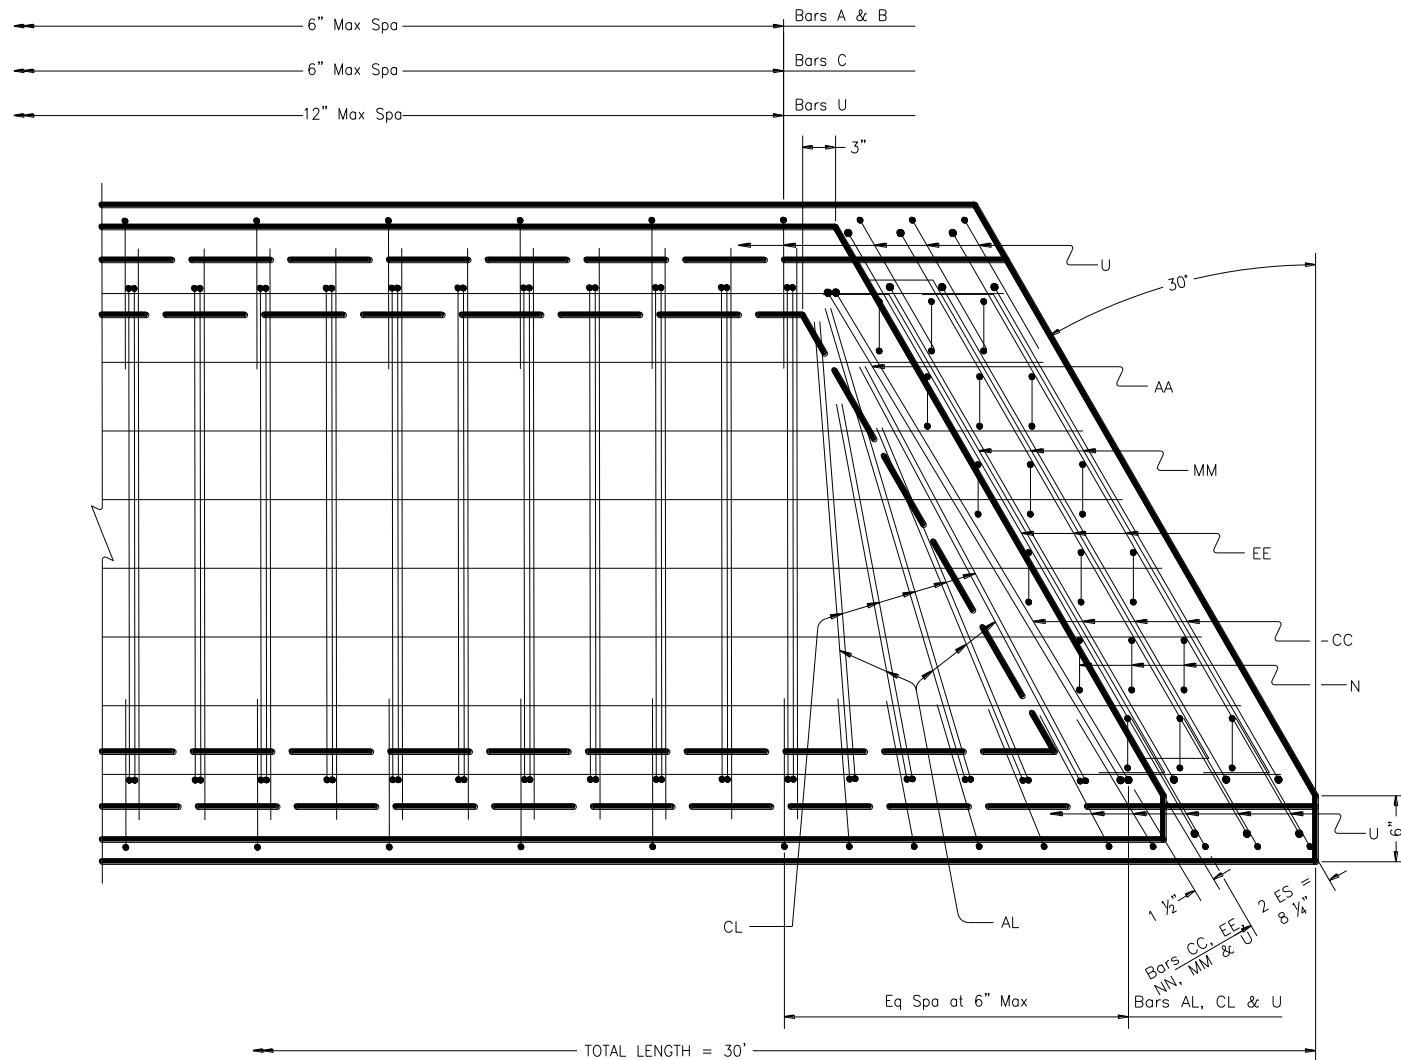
Partial Plan – Skewed End. Beams 5B40-2 and 5B40-3
